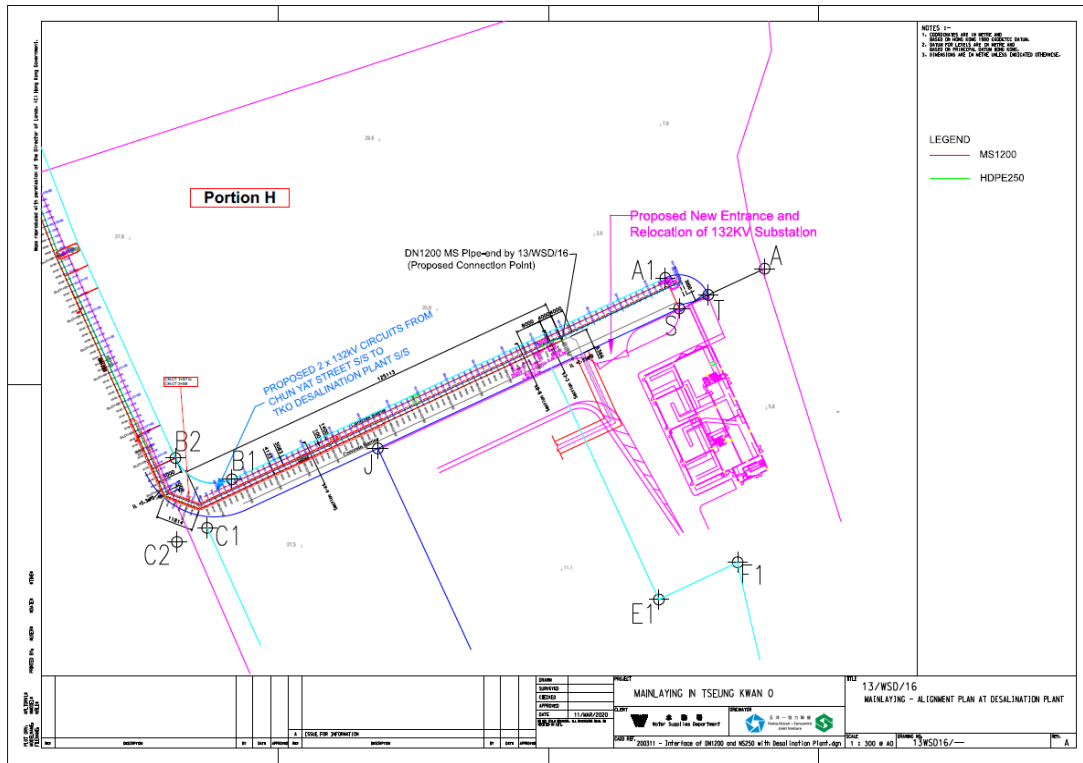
Location Plan for CH.CT 0+07 – 2+58
